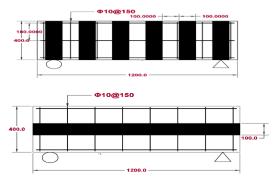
Details of the Tested Beam strengthened by sheet carbon
